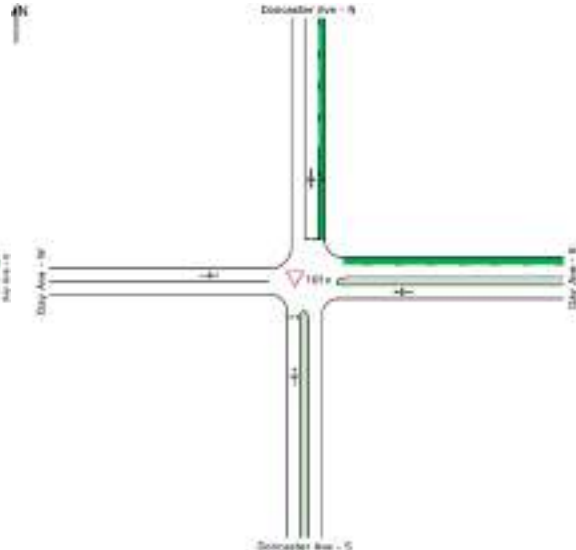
Proposed Doncaster Avenue/ Day Avenue layout
